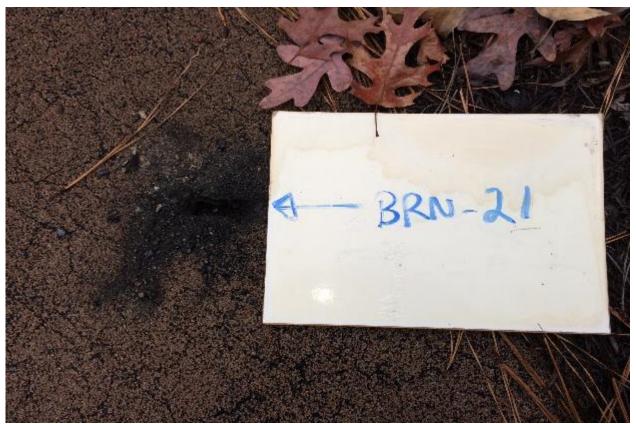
Laboratory analyses did not detect asbestos minerals within asphalt roof sample BRN-21 collected from the North Administrative Building roof.
